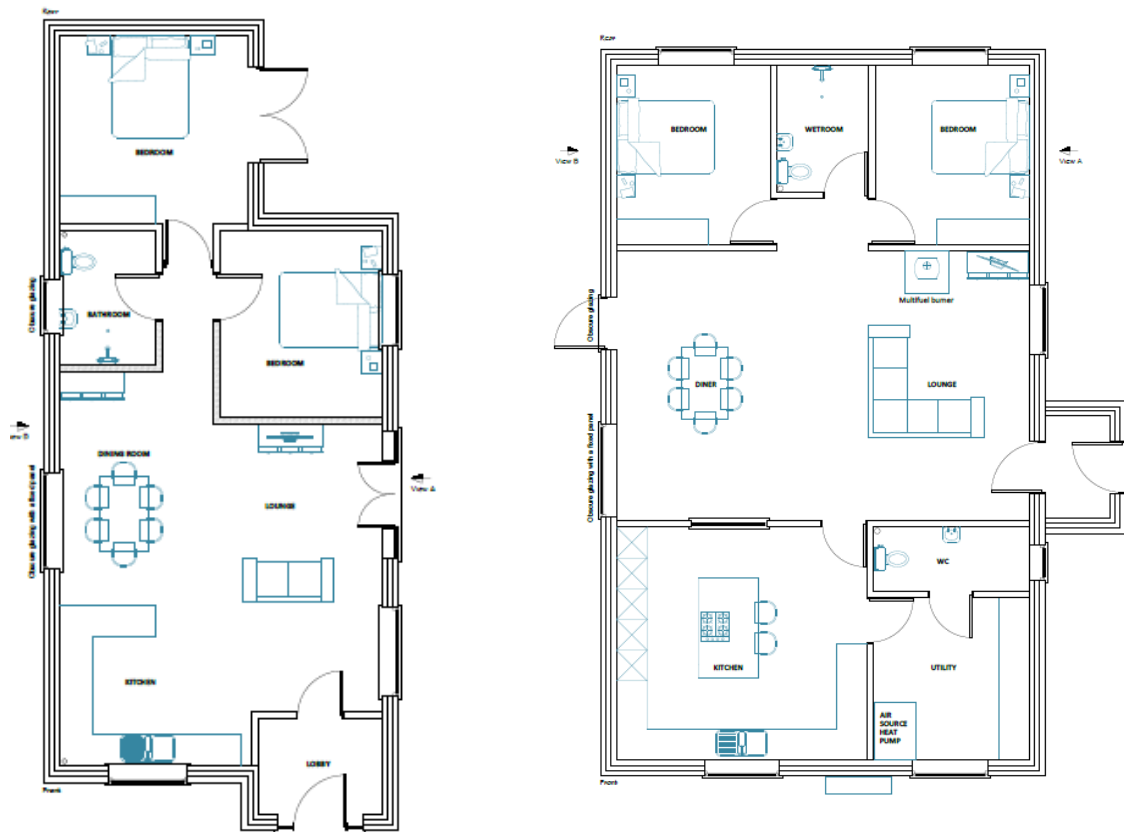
Previously approved floor plan (DOV/21/01760) (left) Proposed floor plan (right)
